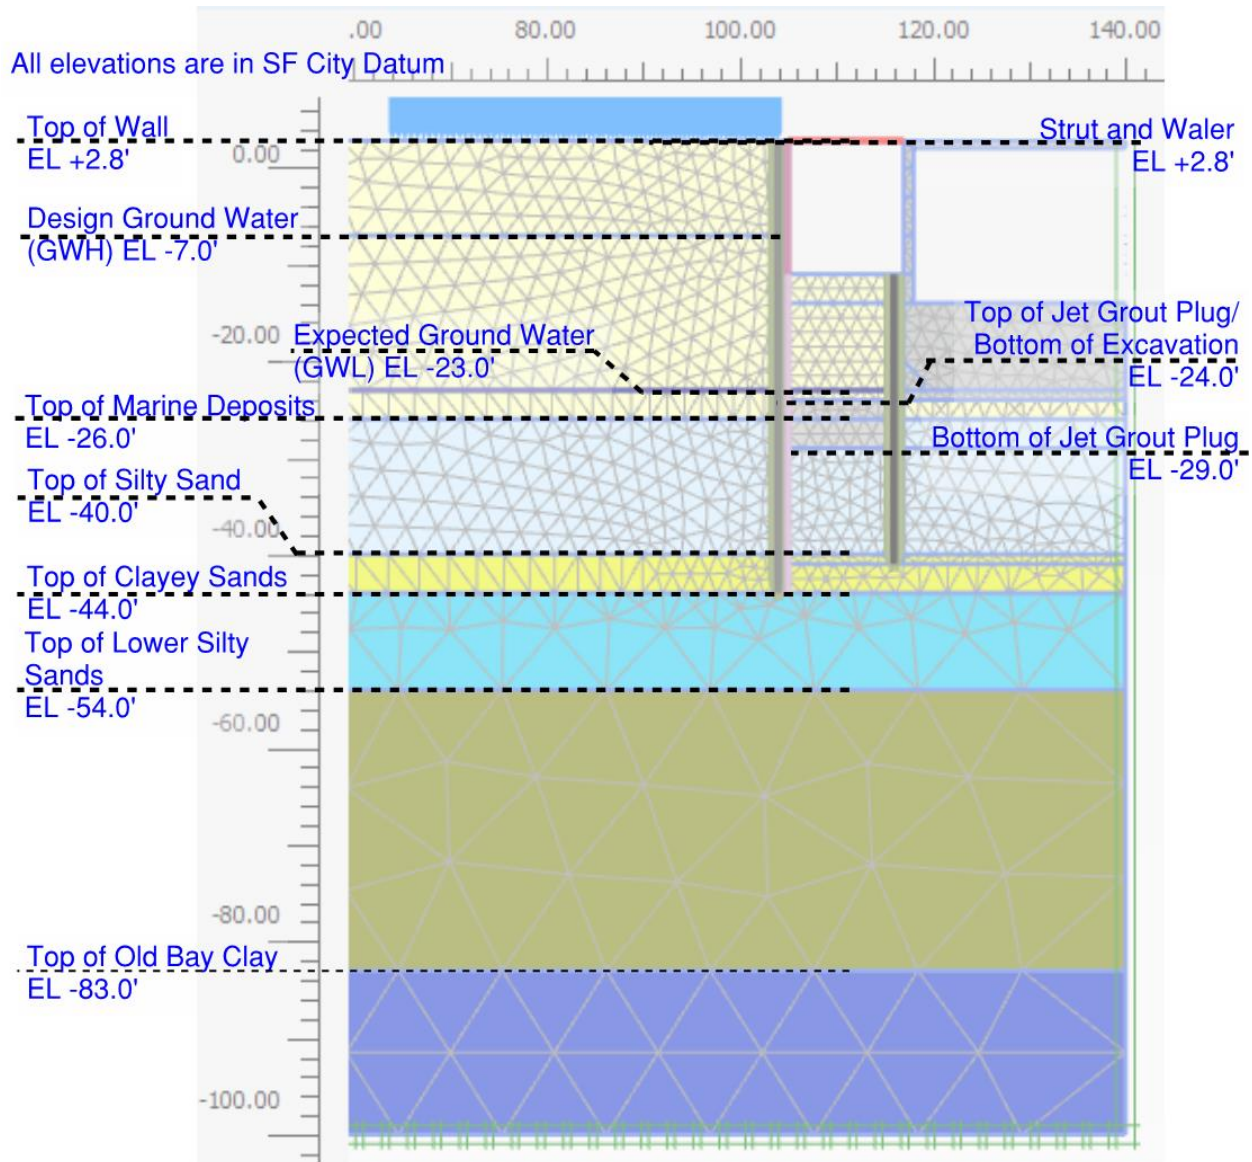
PLAXIS model subsurface profile and support element elevations
